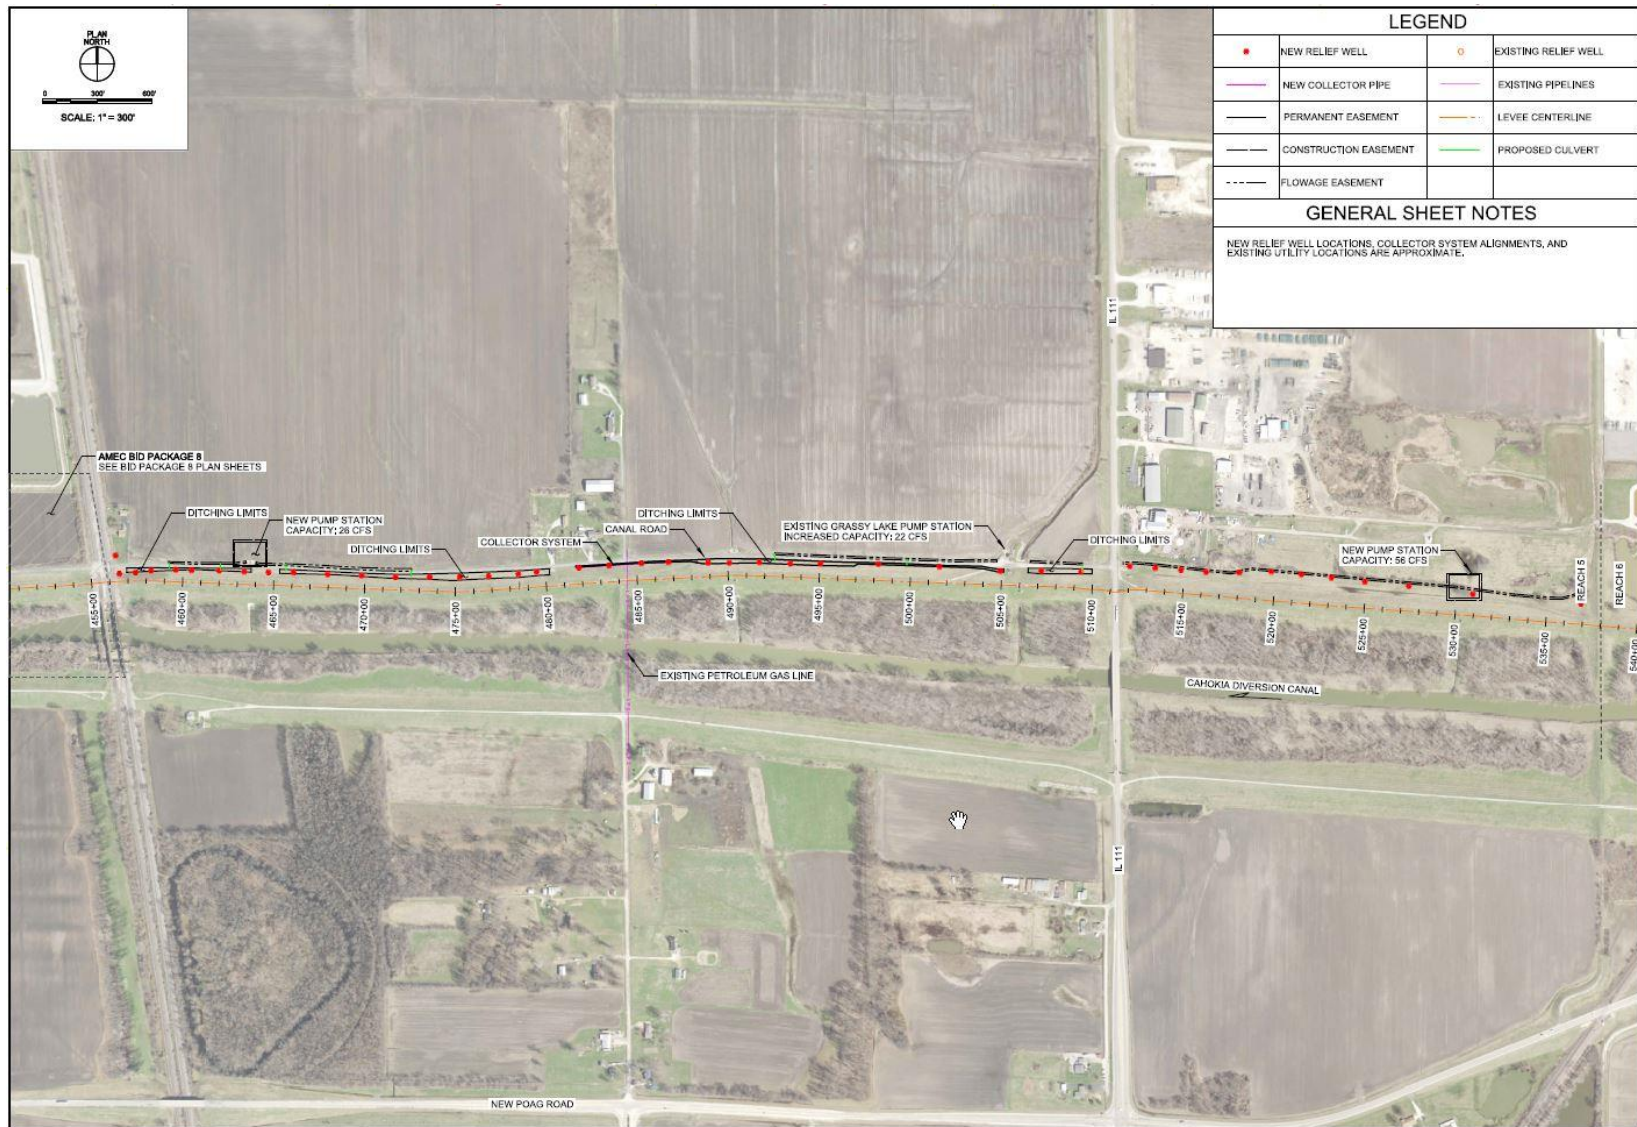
Proposed features for reach 5 for the Standards Plan and Standards Plan with Risk-Informed Screening Alternatives.
